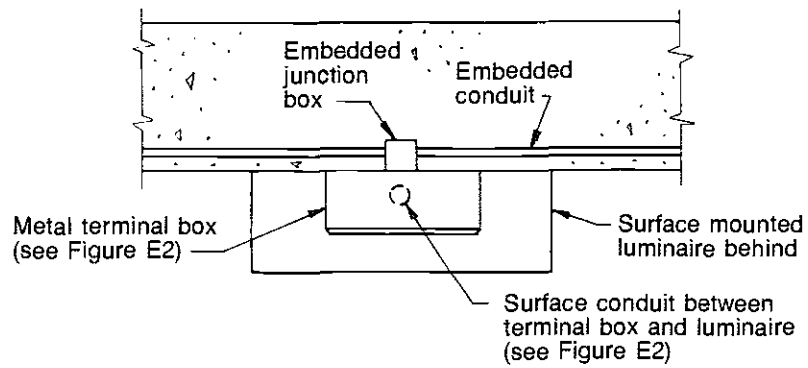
TYPICAL LAYOUT OF EMBEDDED CONDUIT, SURFACE MOUNTED TERMINAL BOX AND SURFACE MOUNTED LUMINAIRE
